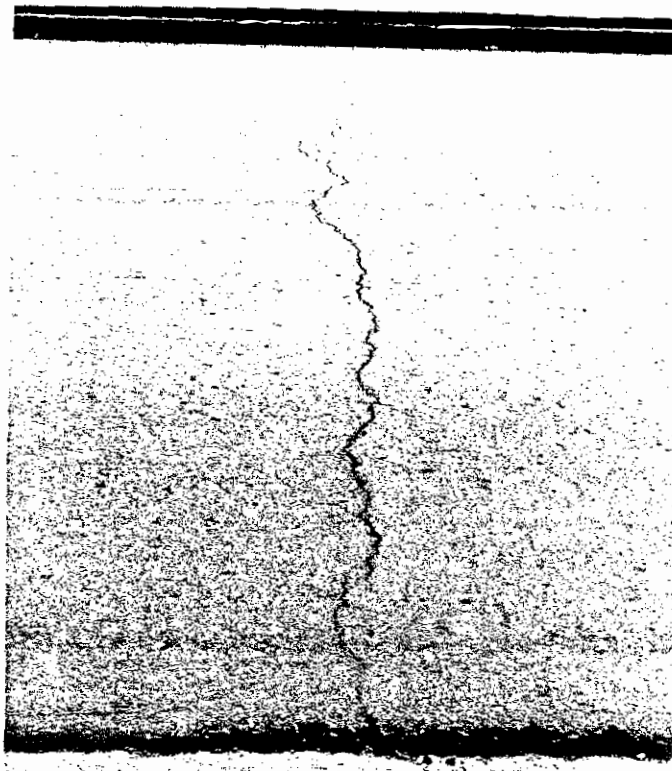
Transverse Reflective Cracking of Pozzolanic Base
